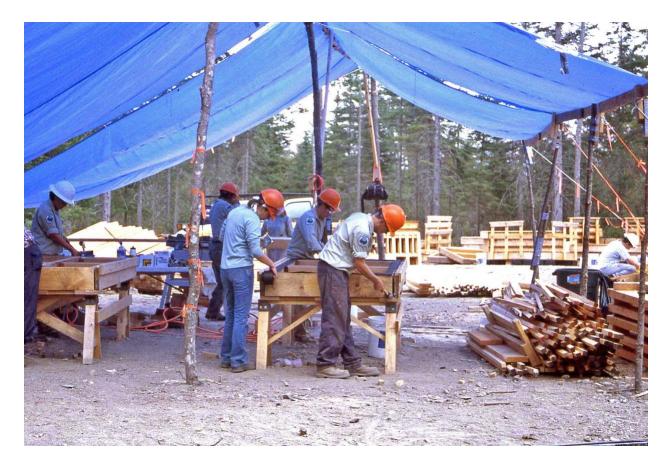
Maine Conservation Corp crew members at assembly site in summer 2002. Member in central foreground is spiking an end joist on a boardwalk section (see Fig. 6) using a small sledgehammer (zoom in). The incomplete section rests in a jig supported on sawhorses.⁴⁵ An incomplete section in another jig is at far left. Its middle joist is in place. The heads of three spikes can be seen on the end joist (zoom in). A pile of bump railings is on the right. Stockpiled components of interpretive stations including railings (see Fig. 8) occupy right background, and a pile large dimension lumber rests in far left background. Ronald B. Davis photo.
